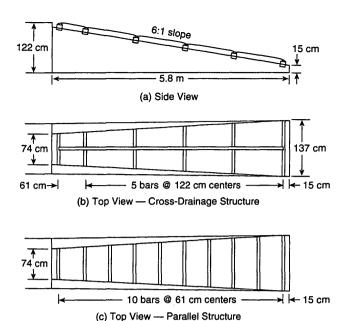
Safety end sections with 6:1 slopes for 122-cm (48-in.) pipe culverts.
